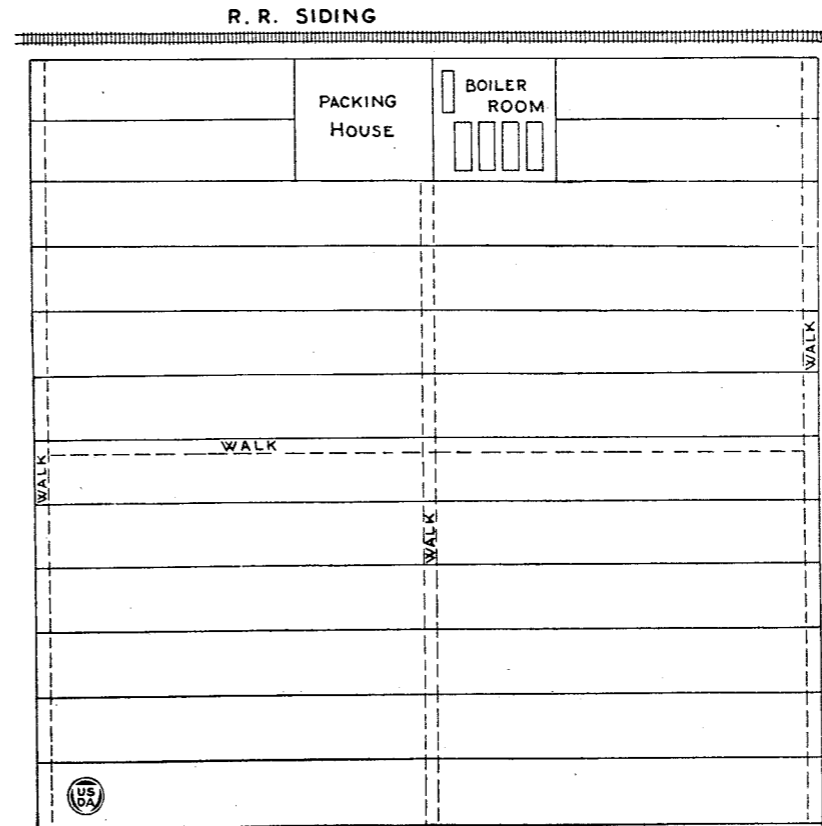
A range of ridge-and-furrow houses well arranged to reduce labor to a minimum.
